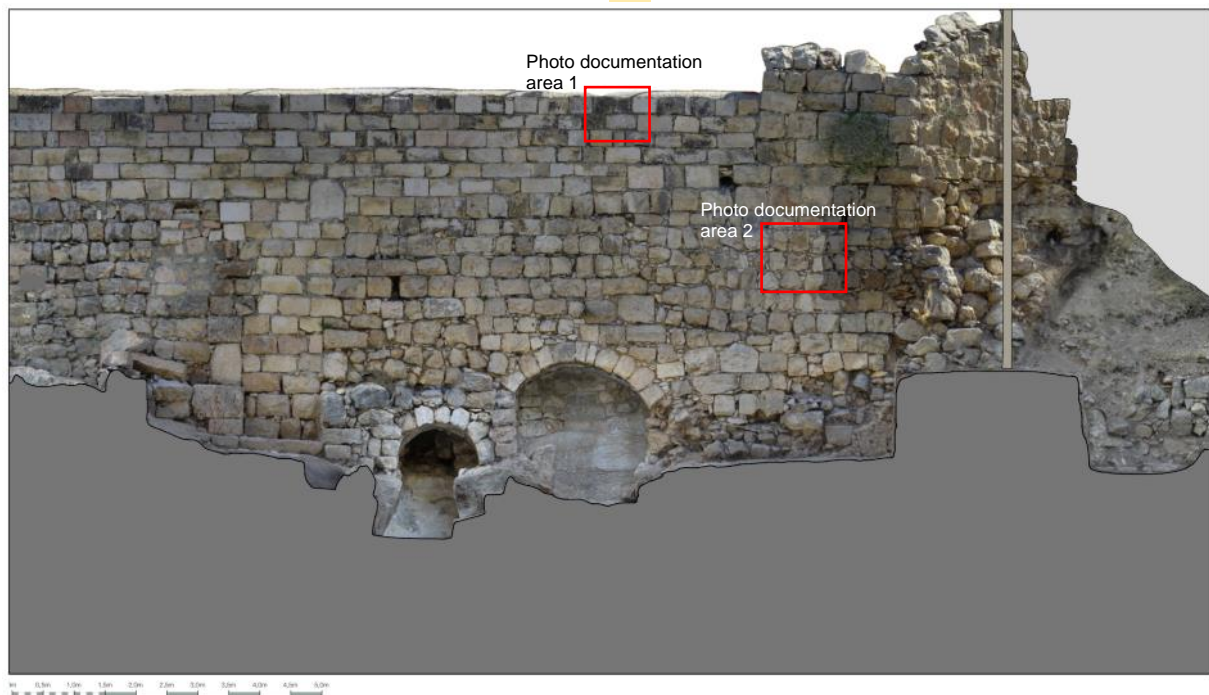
ortho photo, section, view south west on big cemetery wall A, E. Thierry 2016
